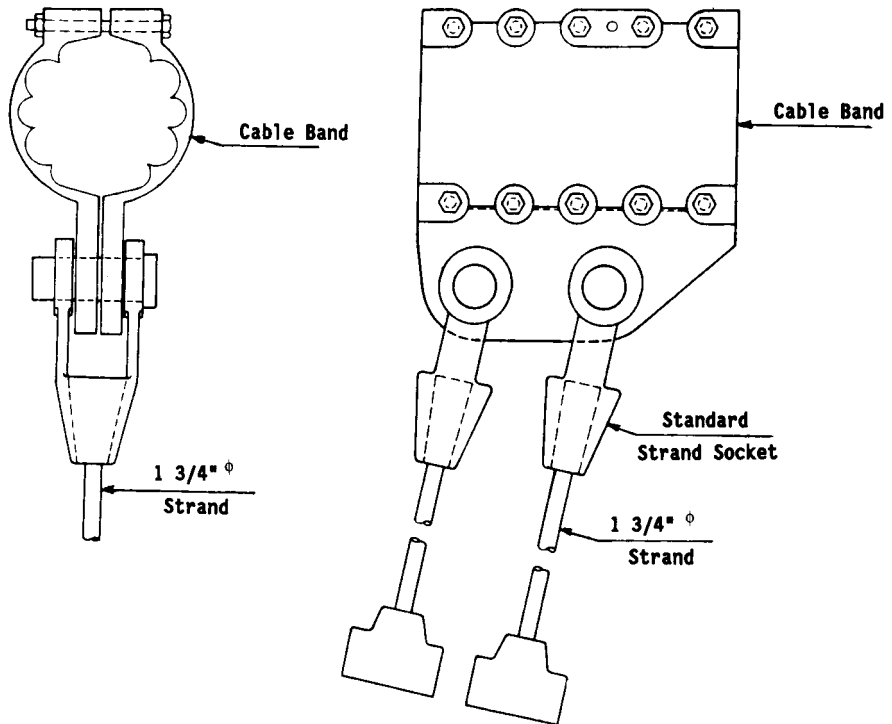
Cable band and suspender detail used for the Hennepin Avenue Bridge.
